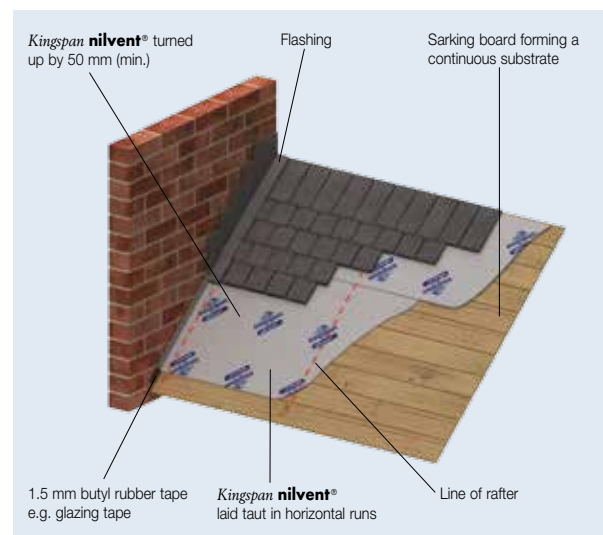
Abutments – Fully Supported Horizontal Installation with Natural Slates
